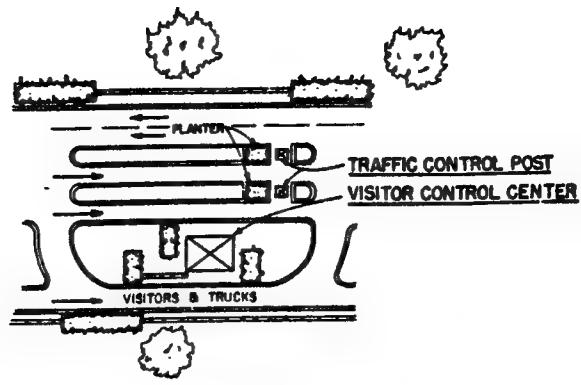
shows a Visitor Control Center (VCC). The VCC is a 645 square foot control center for the guard force at the access point. The building contains a guard station for guards to oversee the equipment and operation of the access point. The controls for the intrusion detection equipment, surveillance monitors, vehicle barricades, security lighting, and the communication equipment for the access point are located in this facility. Personnel in the visitor control center also handle the special cases of visitors and trucks applying for entry to the installation. The building has a waiting area for guards inspecting trucks and other vehicles. Visitors will come to this facility for information and to gain access to the
